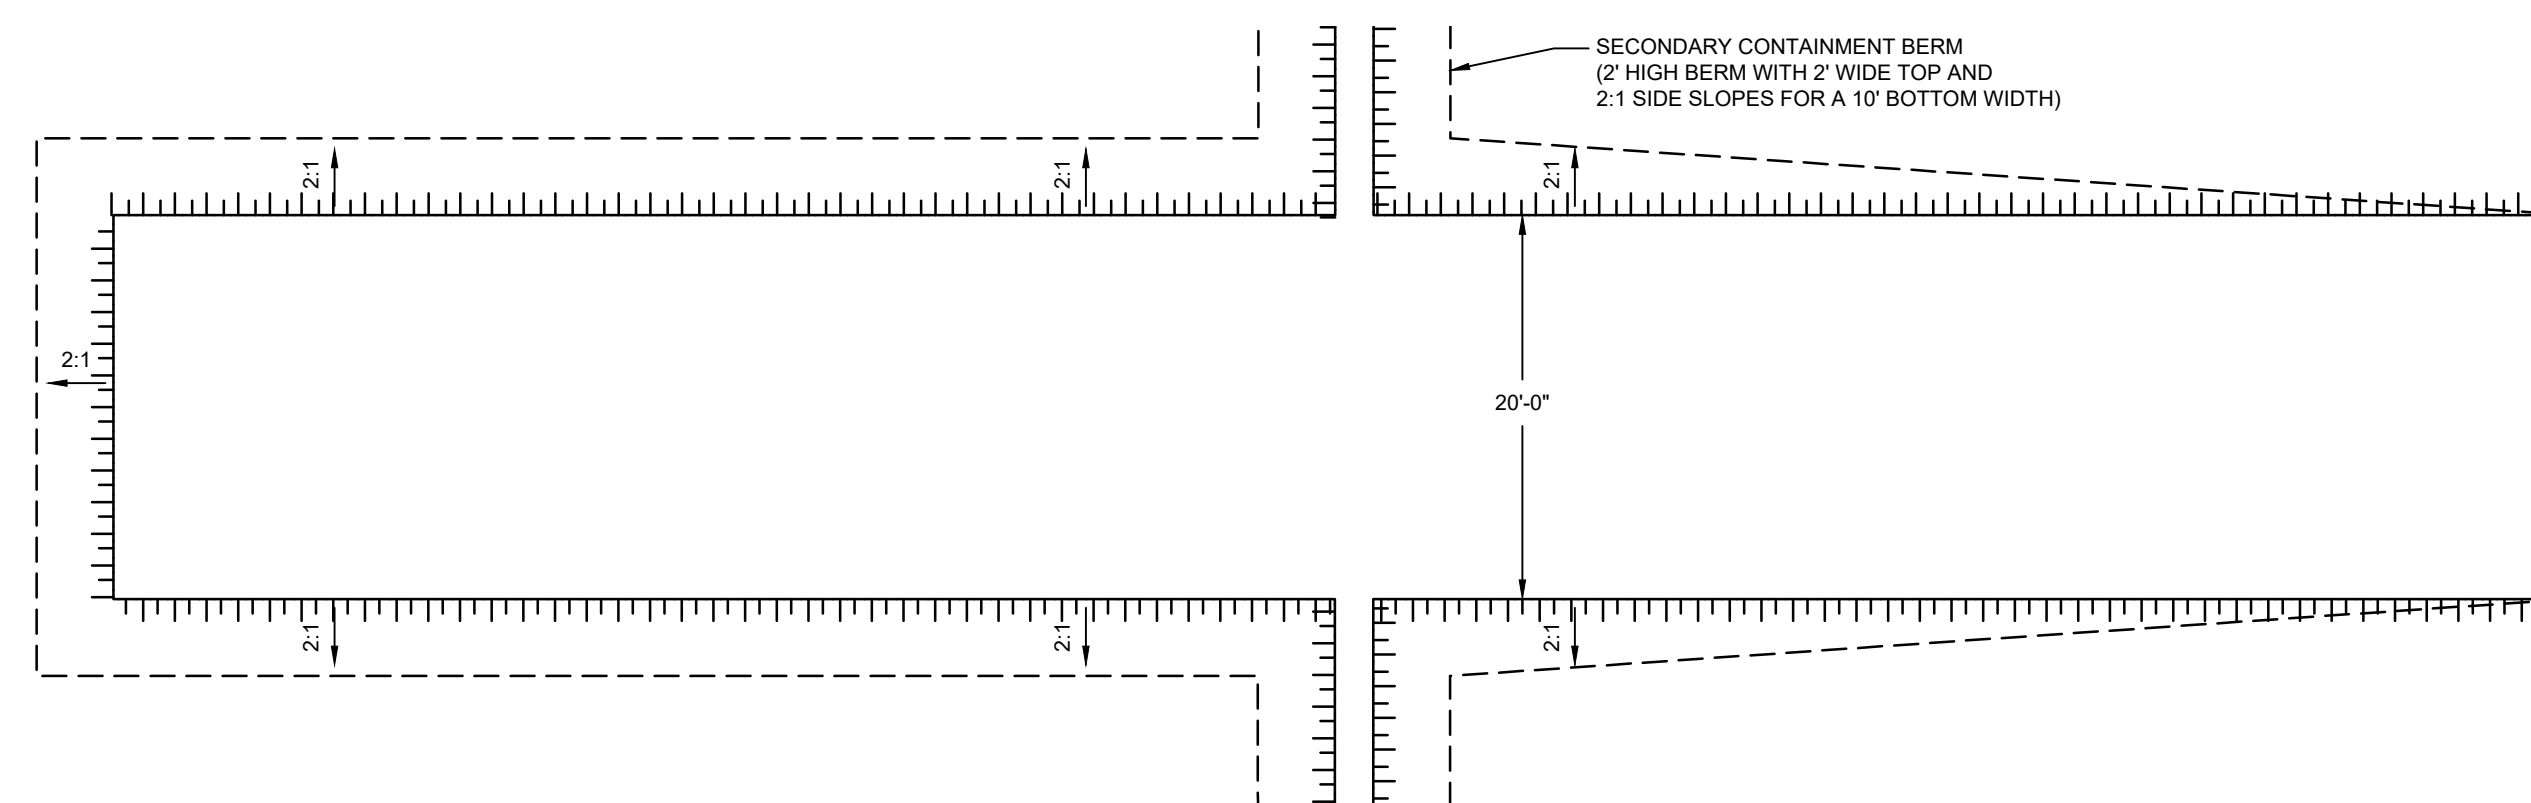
TEMPORARY EXCAVATED MATERIAL STOCKPILE
